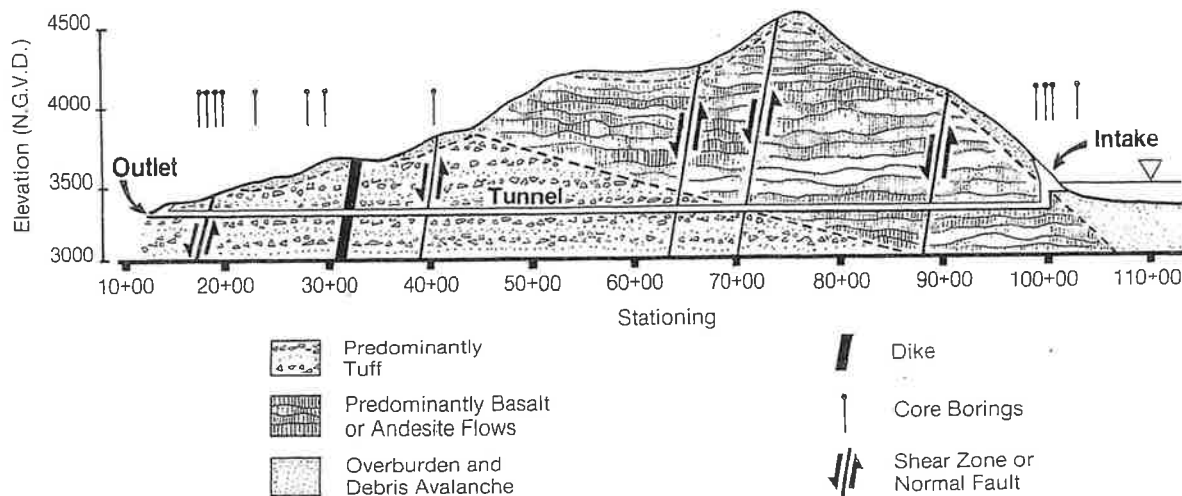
Geologic Profile of Tunnel Alignment Before Mining
